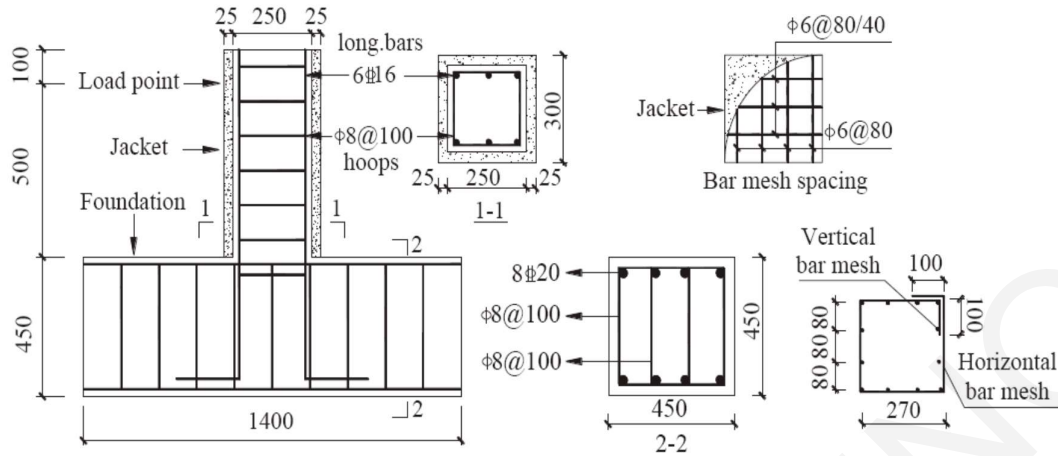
27 : Retrofitting detailing of RC short columns (Deng et al., 2018)
